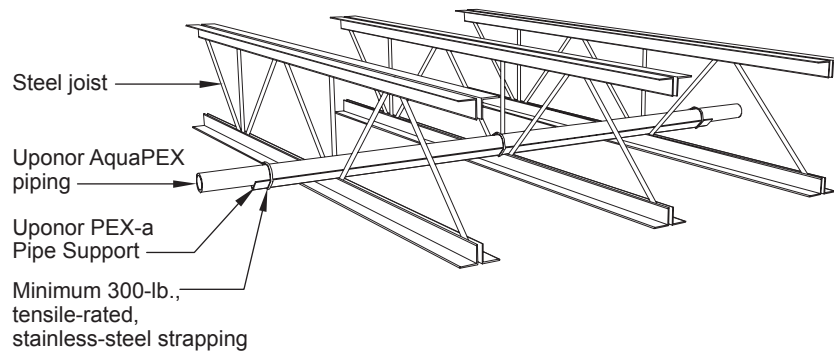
Uponor PEX Supported by Steel Joists and PEX-a Pipe Support
